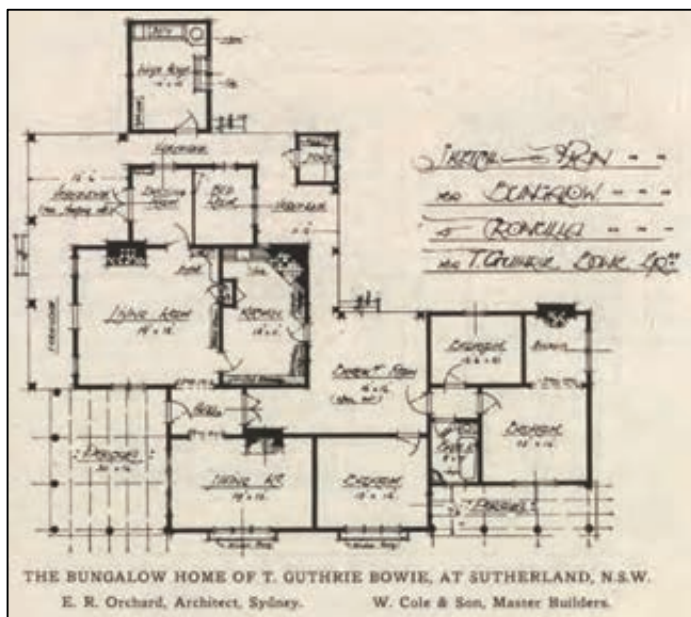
The architect's floor plan – the reference to 'at Cronulla' was incorrect
